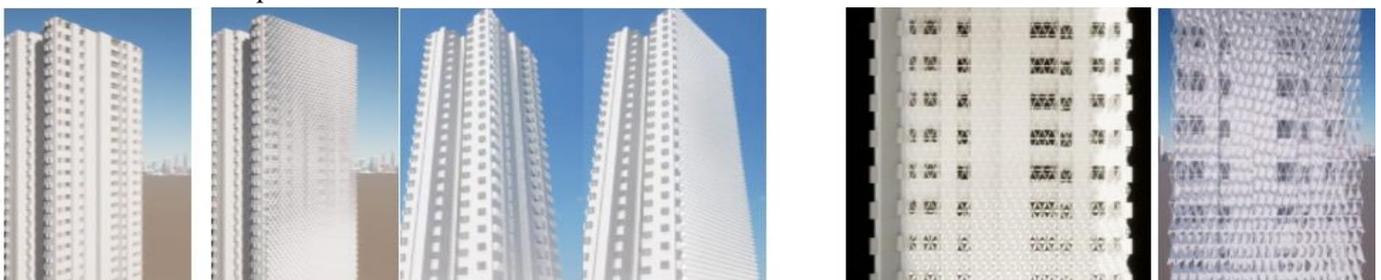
and 1.7: Comparatives of building with parametric façade and without parametric, Elevation of parametric facade facade
